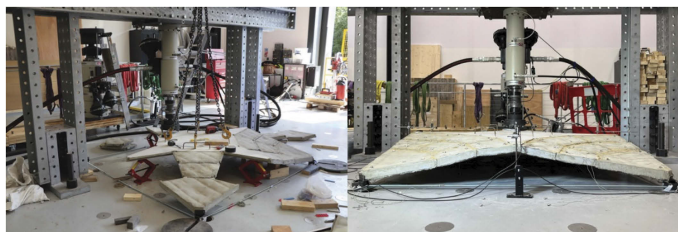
The prototype segmented fan concrete shell during assembly (left) and fully assembled (right).
